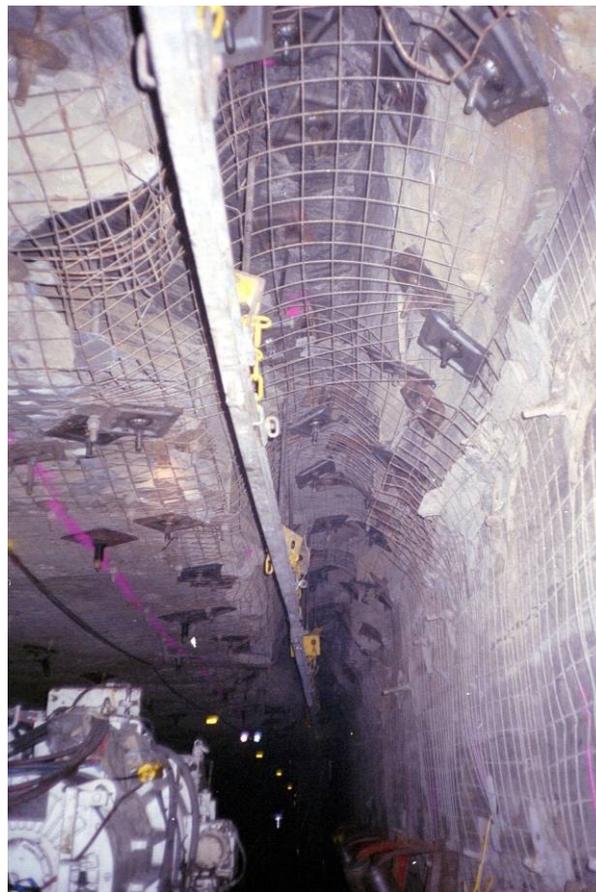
Pre existing roof bagging which was washed out by the action of the water
